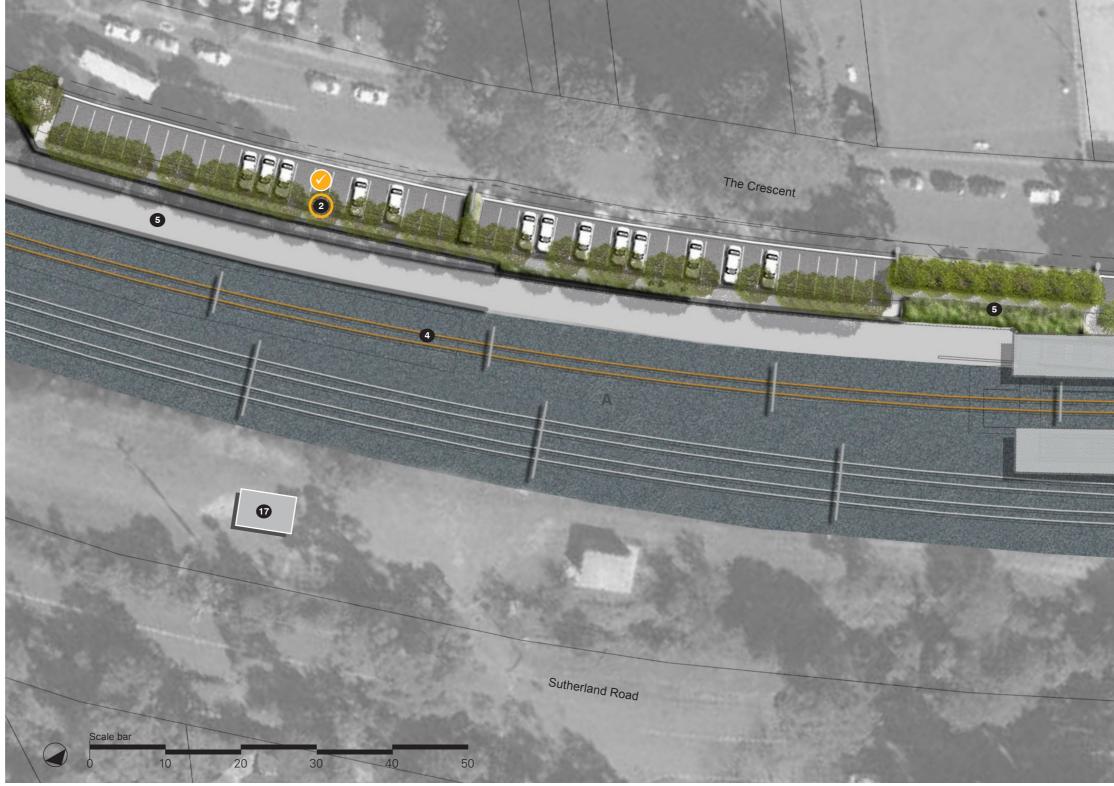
Cheltenham Station Precinct Landscape Master Plan
